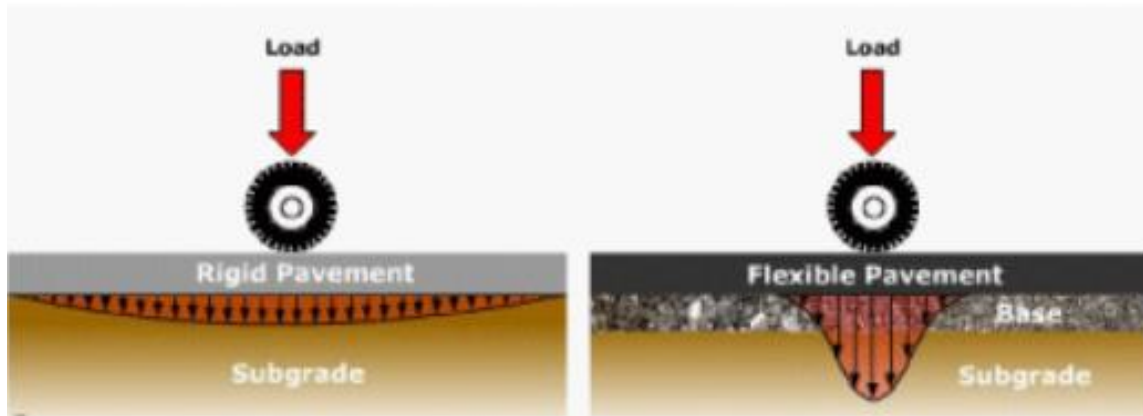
Typical stress distribution under a rigid and a flexible pavement (TxDOT Manual)
